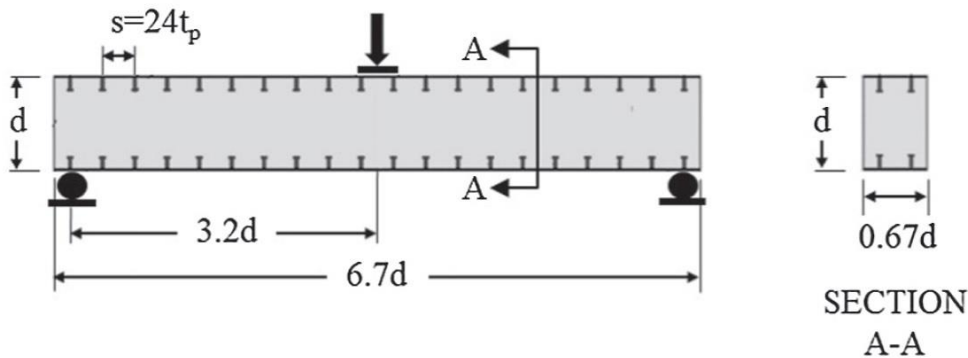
Schematic drawing of tested specimen SP1-3 (Sener et al., 2016)
